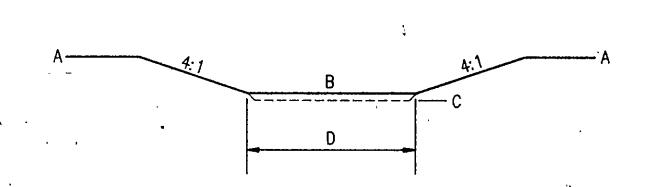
TYPICAL GRADING OF BENCH DRAINS LET-DOWN DITCH INTERFACE
